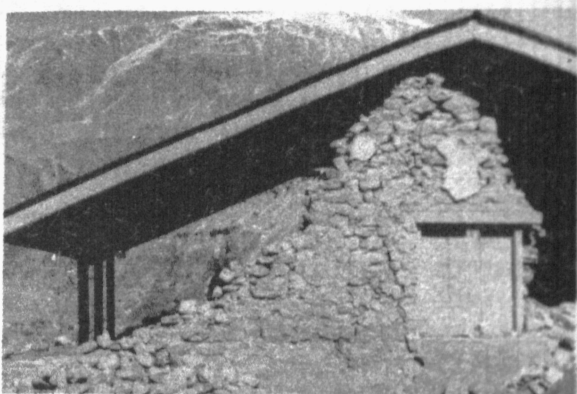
DAMAGE TO GABLE END WALL OF A RSM HOUSE IN MUD MORTAR. ROOF IS SEEN HANGING ON PARTIALLY COLLAPSED WALL AND TIMBER POSTS
